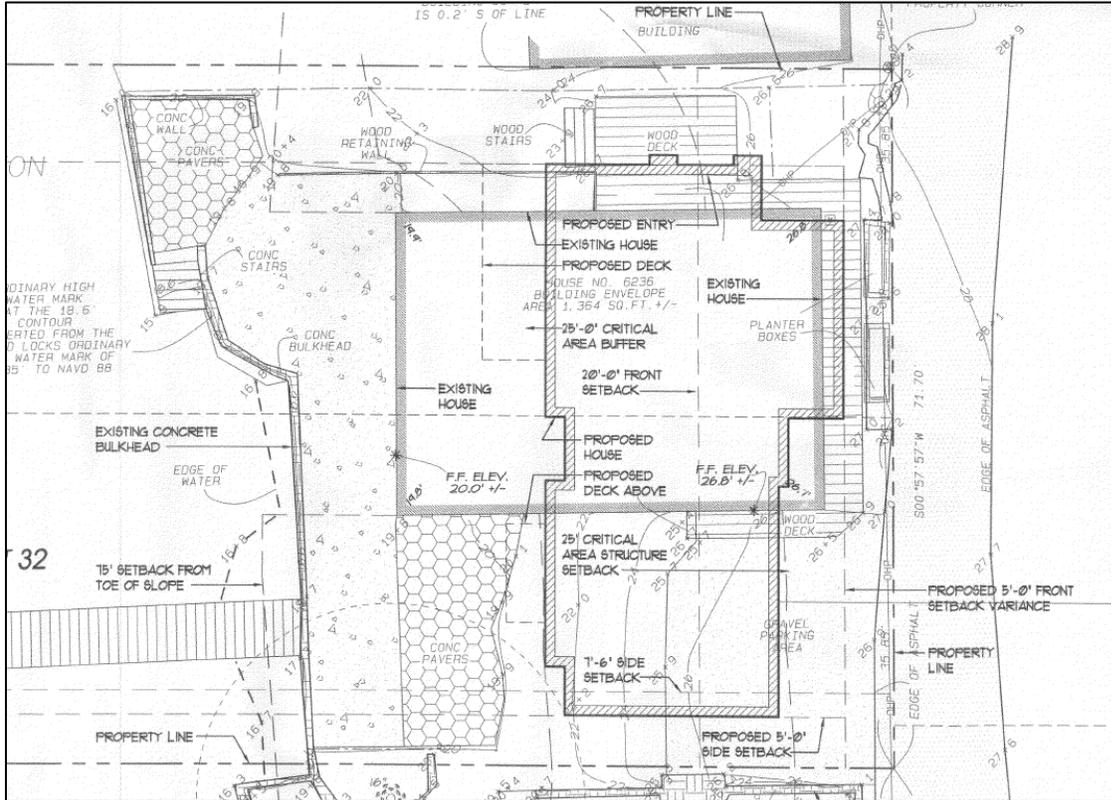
Proposed Site Plan (Shoreline Mitigation Plantings Not Shown)
